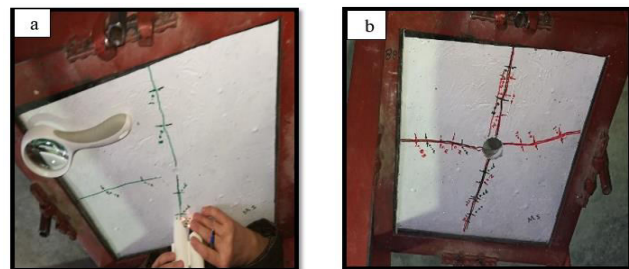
Crack pattern of micro steel fibre: a) initial crack of simply support. b) final crack of simply support.
